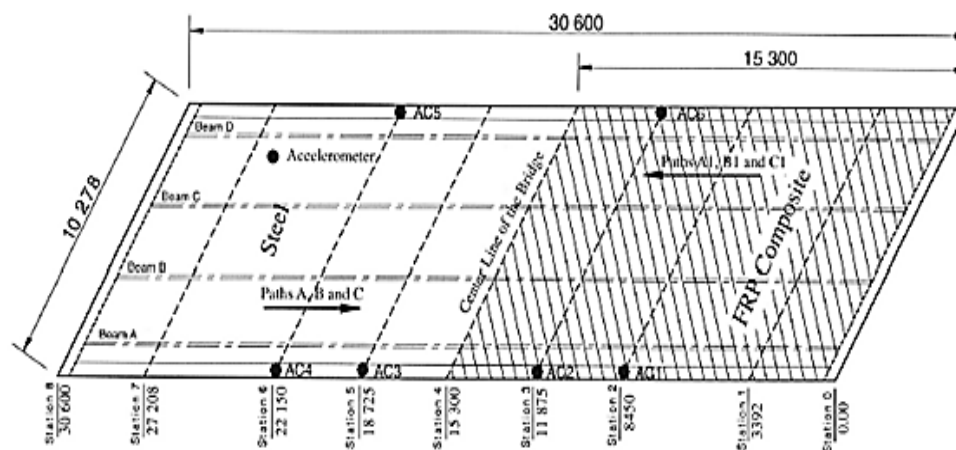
Plan view of Wotton bridge showing the two halves of bridge deck reinforced with different materials (El-Salakawy, Benmokrane, & Desgagne, 2003).
